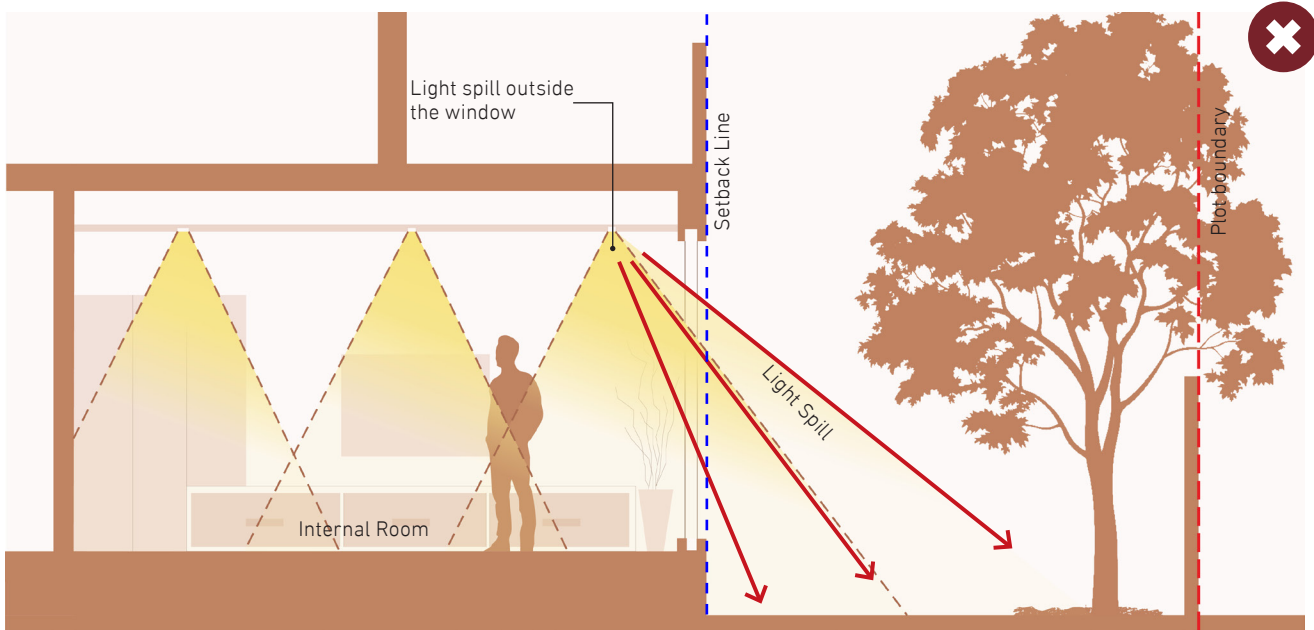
Lighting shall not be visible along the roofline or the boundary wall.
